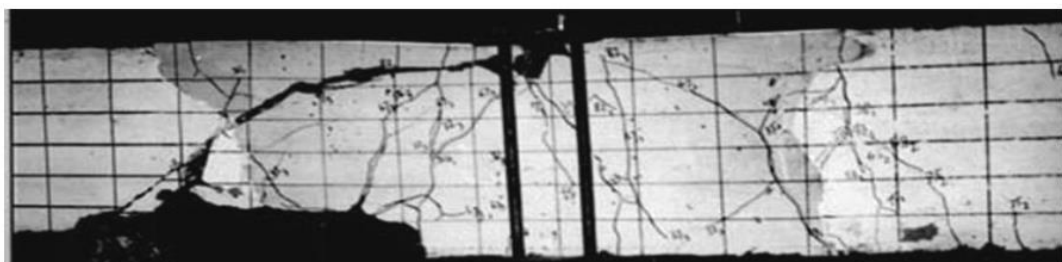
Crack pattern of required beams (Budiono et al.,2000)
